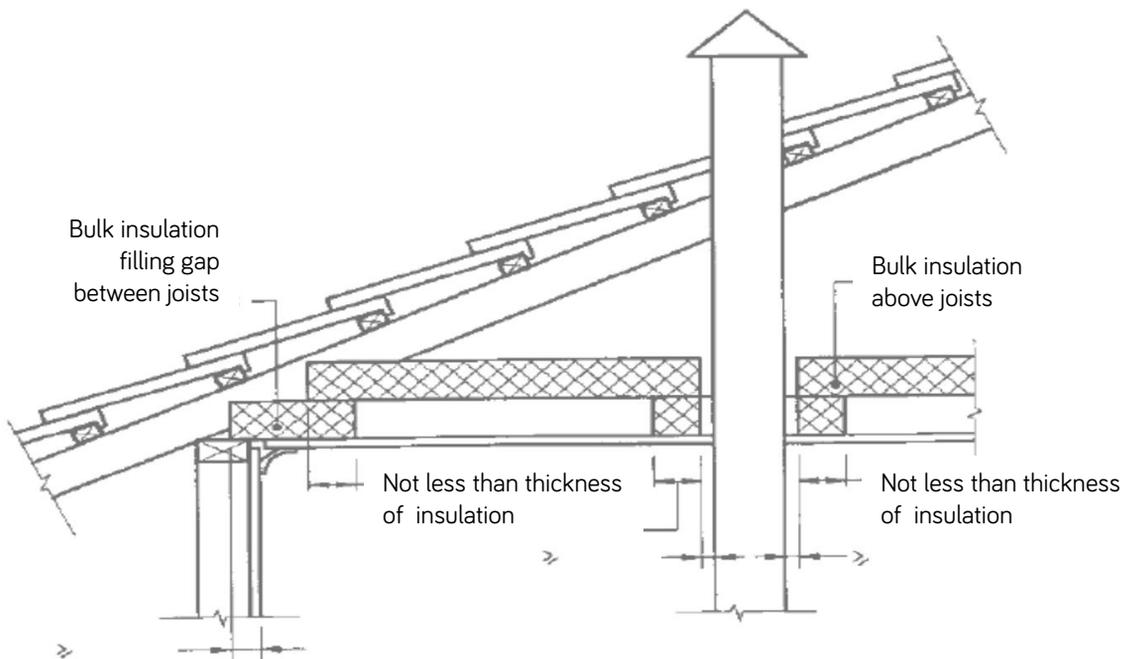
Prevention of air flow below insulation installed on top of ceiling joists.
